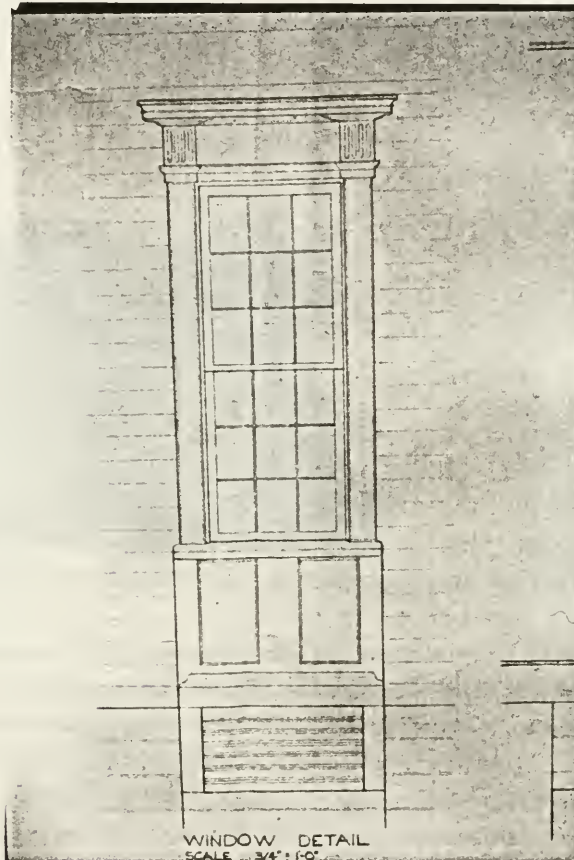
L. Scott Garner Detail of North Elevation First Floor Window
